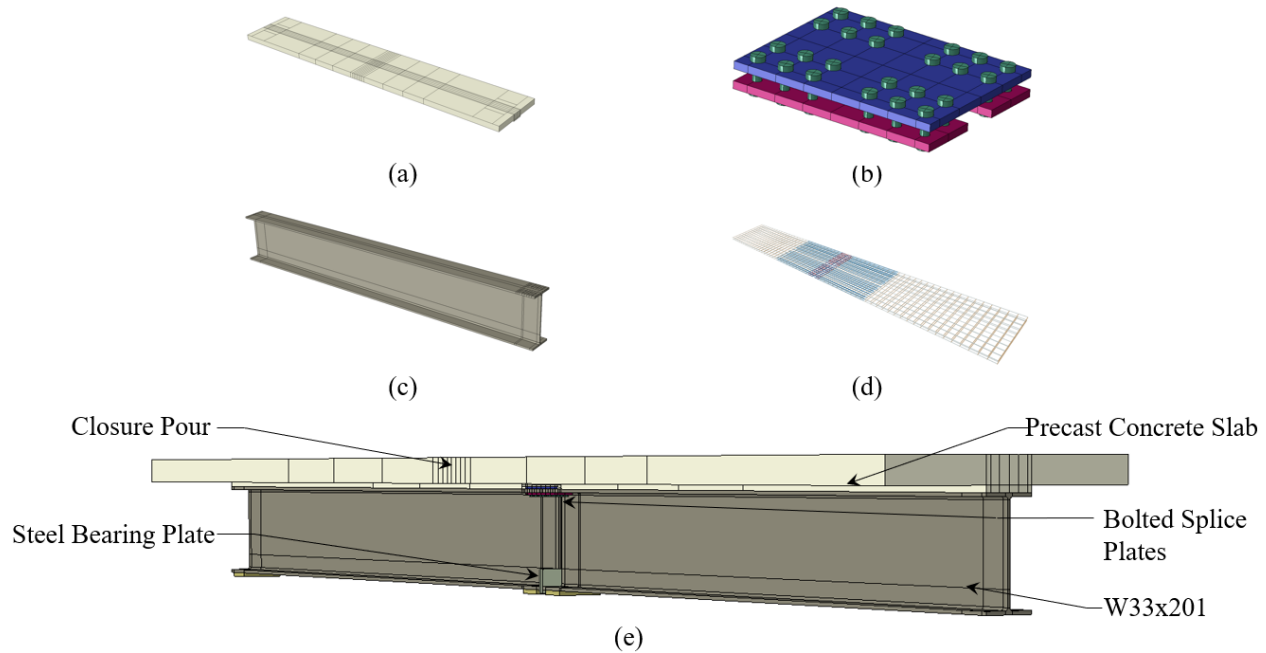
(a) Precast Concrete Deck with Closure Pour, (b) Splice Plates with Bolts, (c) Steel Beam, (d) Rebar Mat, and (e) Model Assembly.
